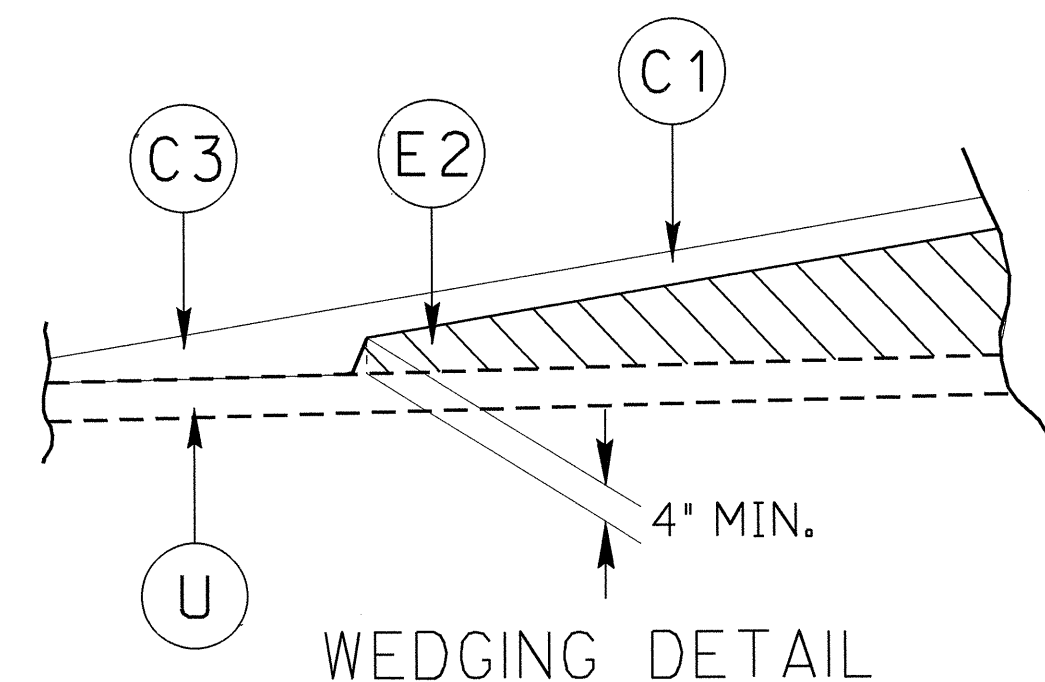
DETAIL SHOWING ASPHALT WEARING SURFACE ON CORED SLAB BRIDGE
